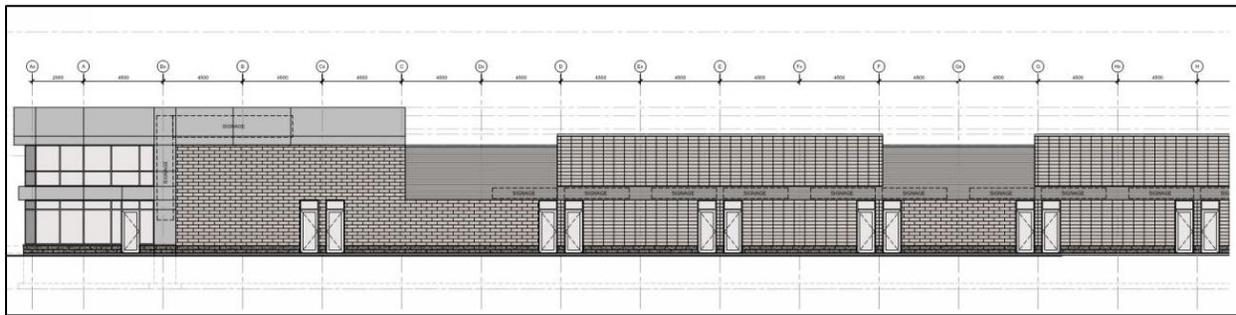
Conceptual multi-unit retail building partial elevation – View looking north (shown as South Elevation on 1 – A301 dated January 16, 2019).
